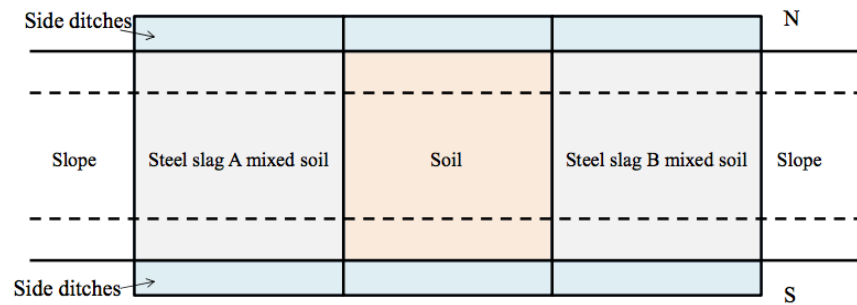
Schematic plan view of constructed embankment in Kataoka et al. (2017) case study.
